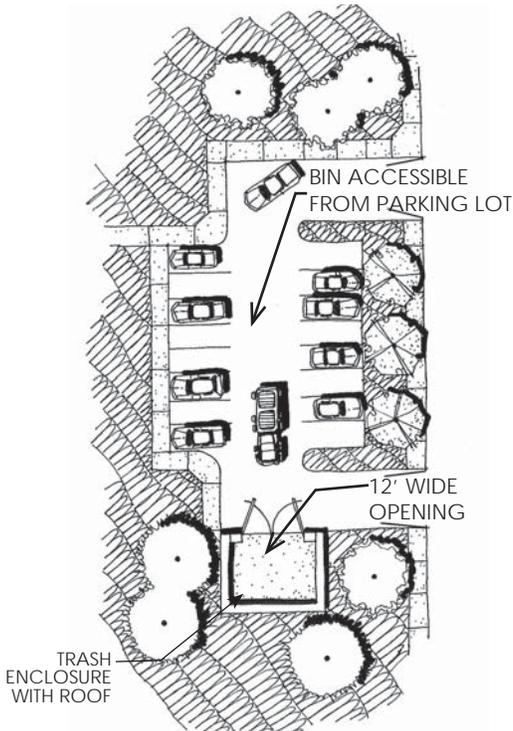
Parking Lot Design with Trash Bin Enclosure
